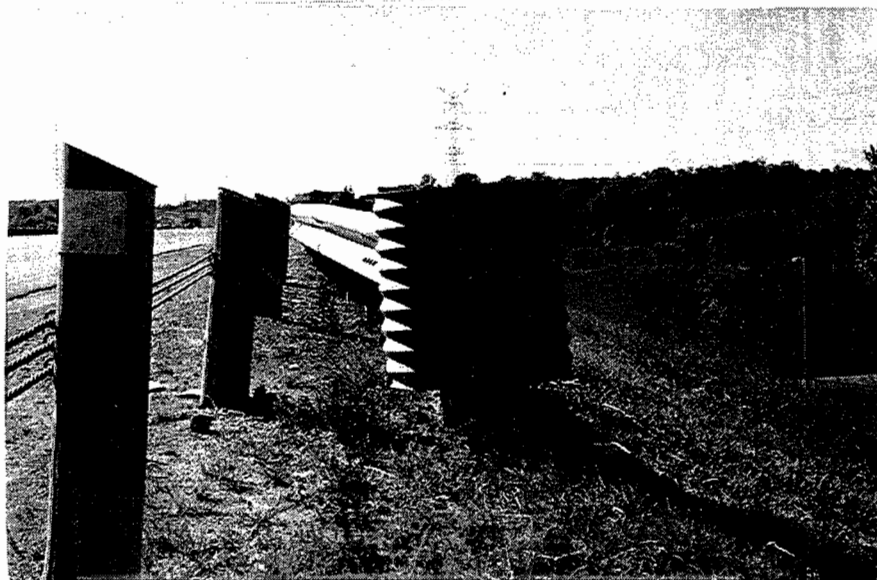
Transition from Cable to Steel Beam Using Eccentric Loader
